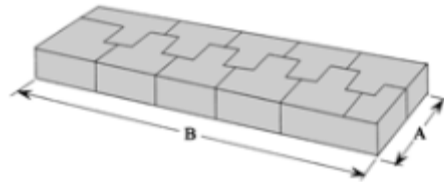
10 Unit Nested T-Hangar Layout
